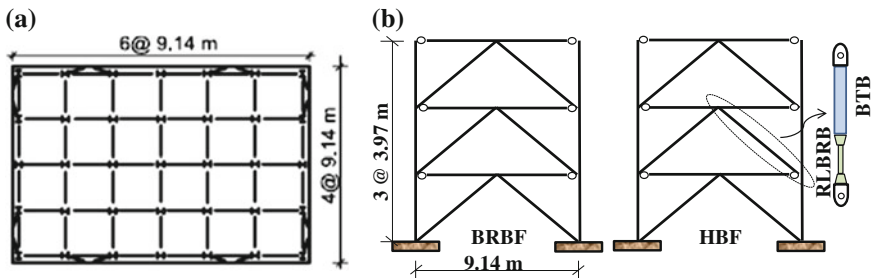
a Plan of 3 story steel building. b Schematic plot of BRBF and HBF
